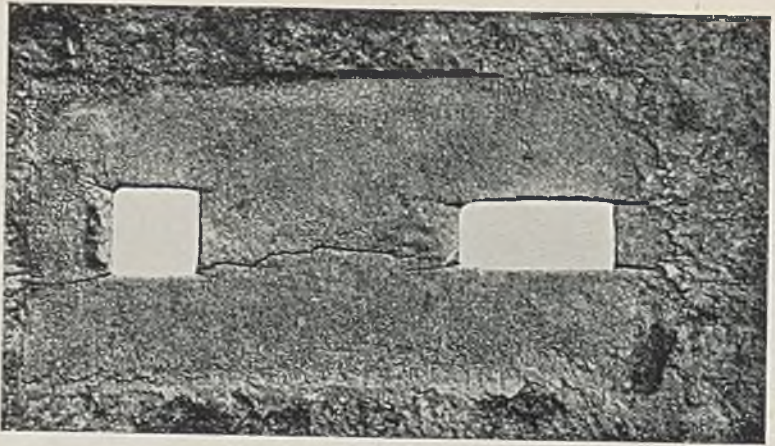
Corrosion-Fatigue Cracks in a Steel Railway Sleeper.
